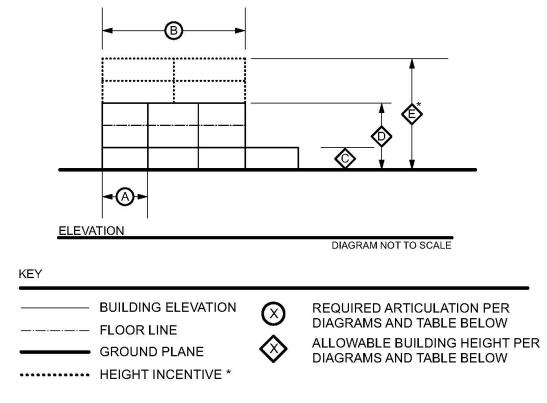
b(4): Bungalow Subdistrict – Building Massing
